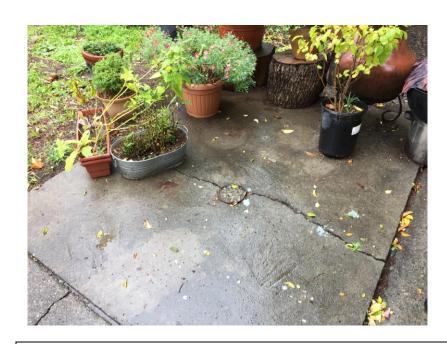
View of abandoned well casing at 376 Yolanda Avenue
